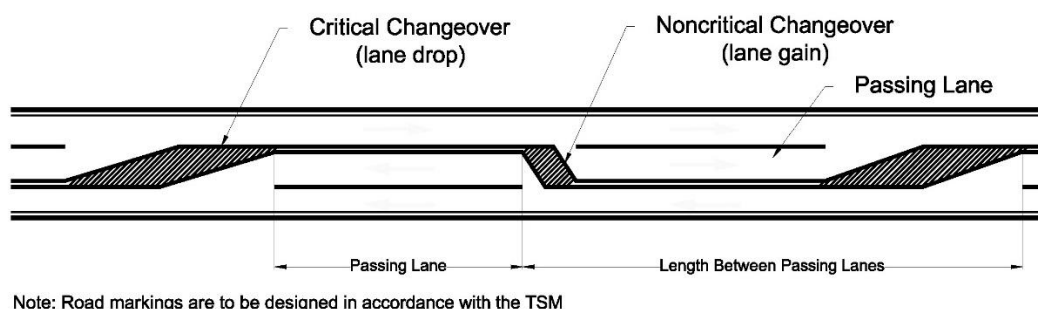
Schematic Layout of a Type 3 Divided Road
